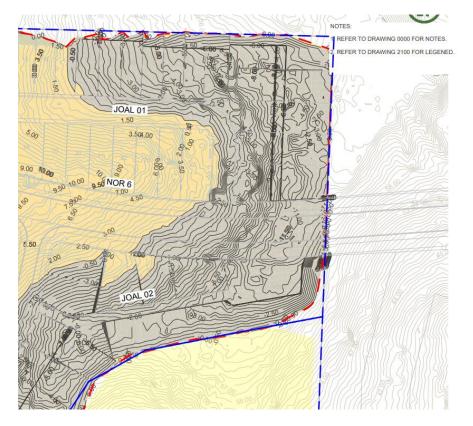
Snip from Appendix 16-3 Stage 1 Earthworks cut fill plans drawing 3725-1-2103
